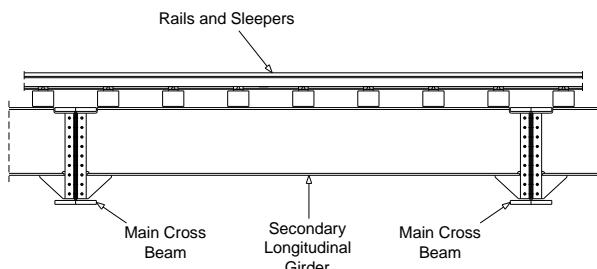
Side view of secondary longitudinal girders with variable end cross sections
